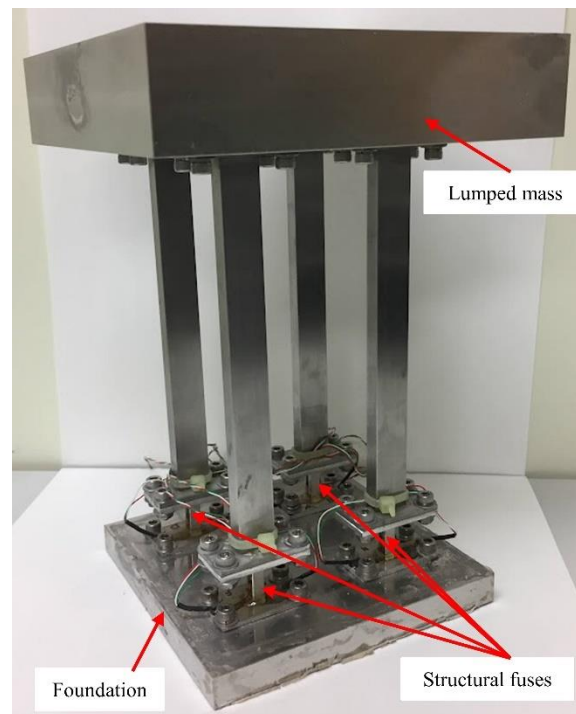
Diagram of ICSS highlighting the instrumented structural fuse locations.
